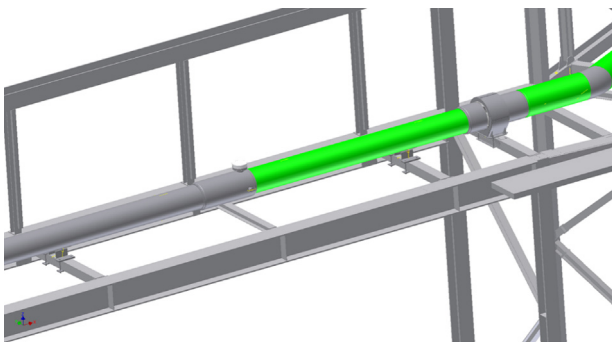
Section of the pipeline with sliding and fixed supports.
